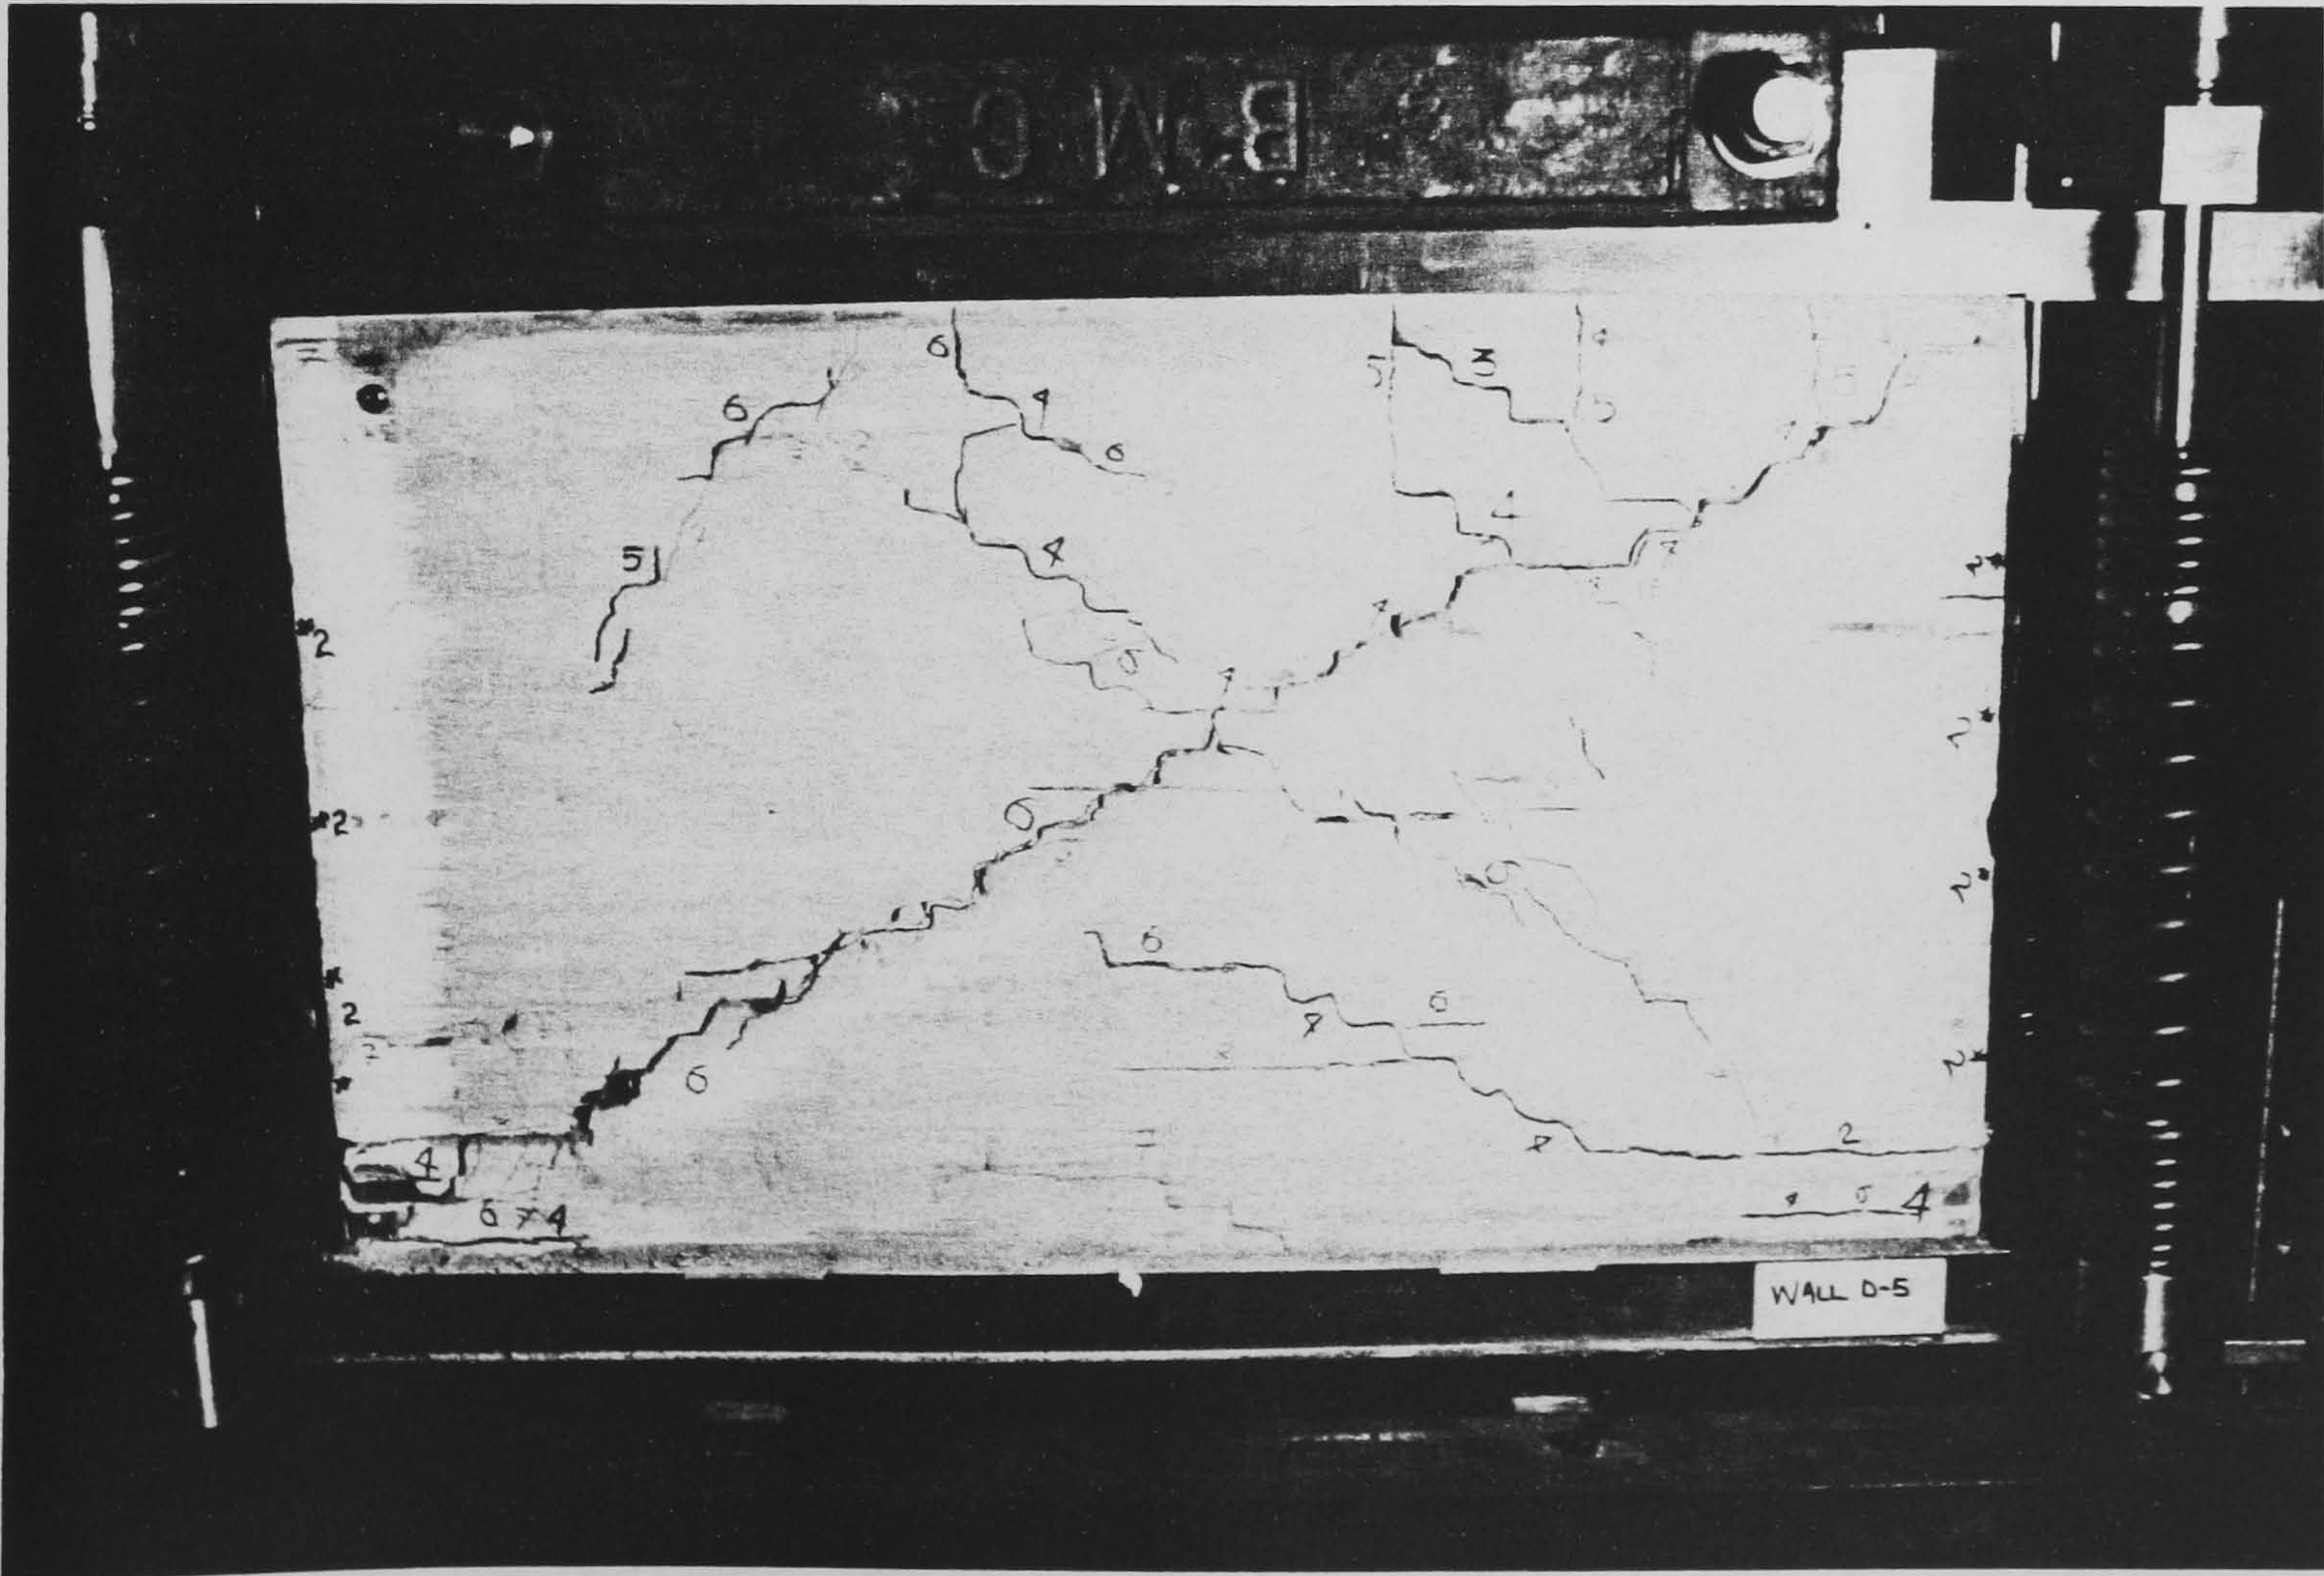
Collapse sequence-frame 2 (wall-D)
